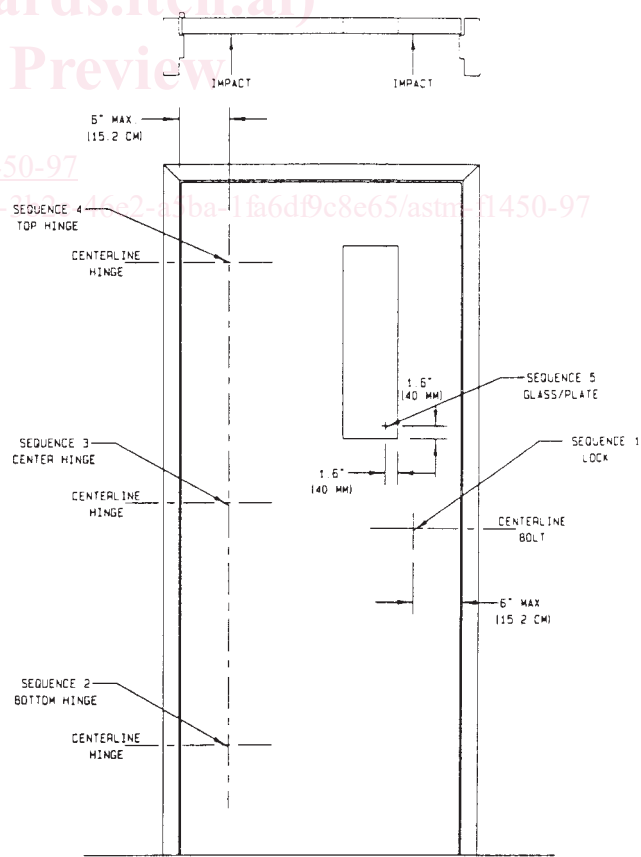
Test Assembly Elevation Location of Strike Points Described in Table 1
